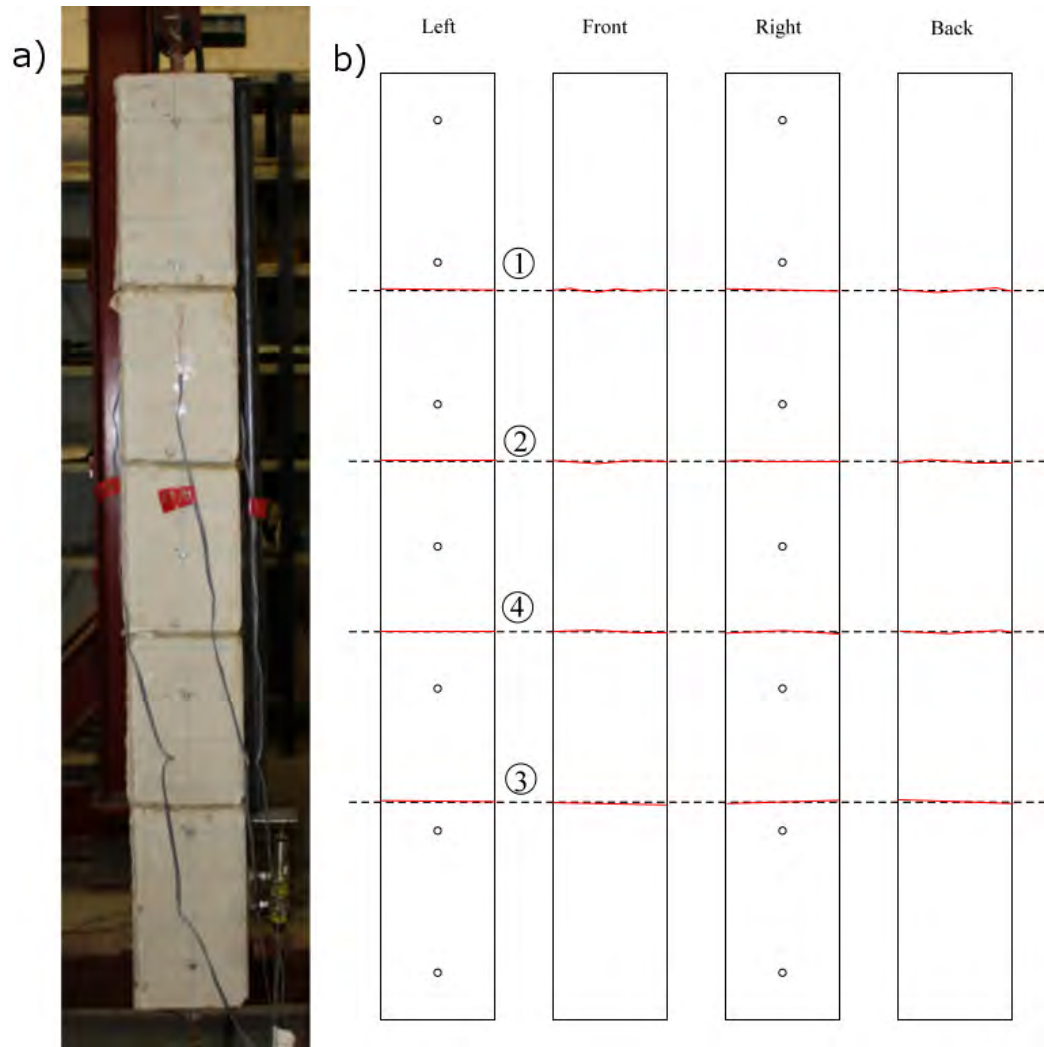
C3S10n: a) specimen during testing b) crack pattern.
